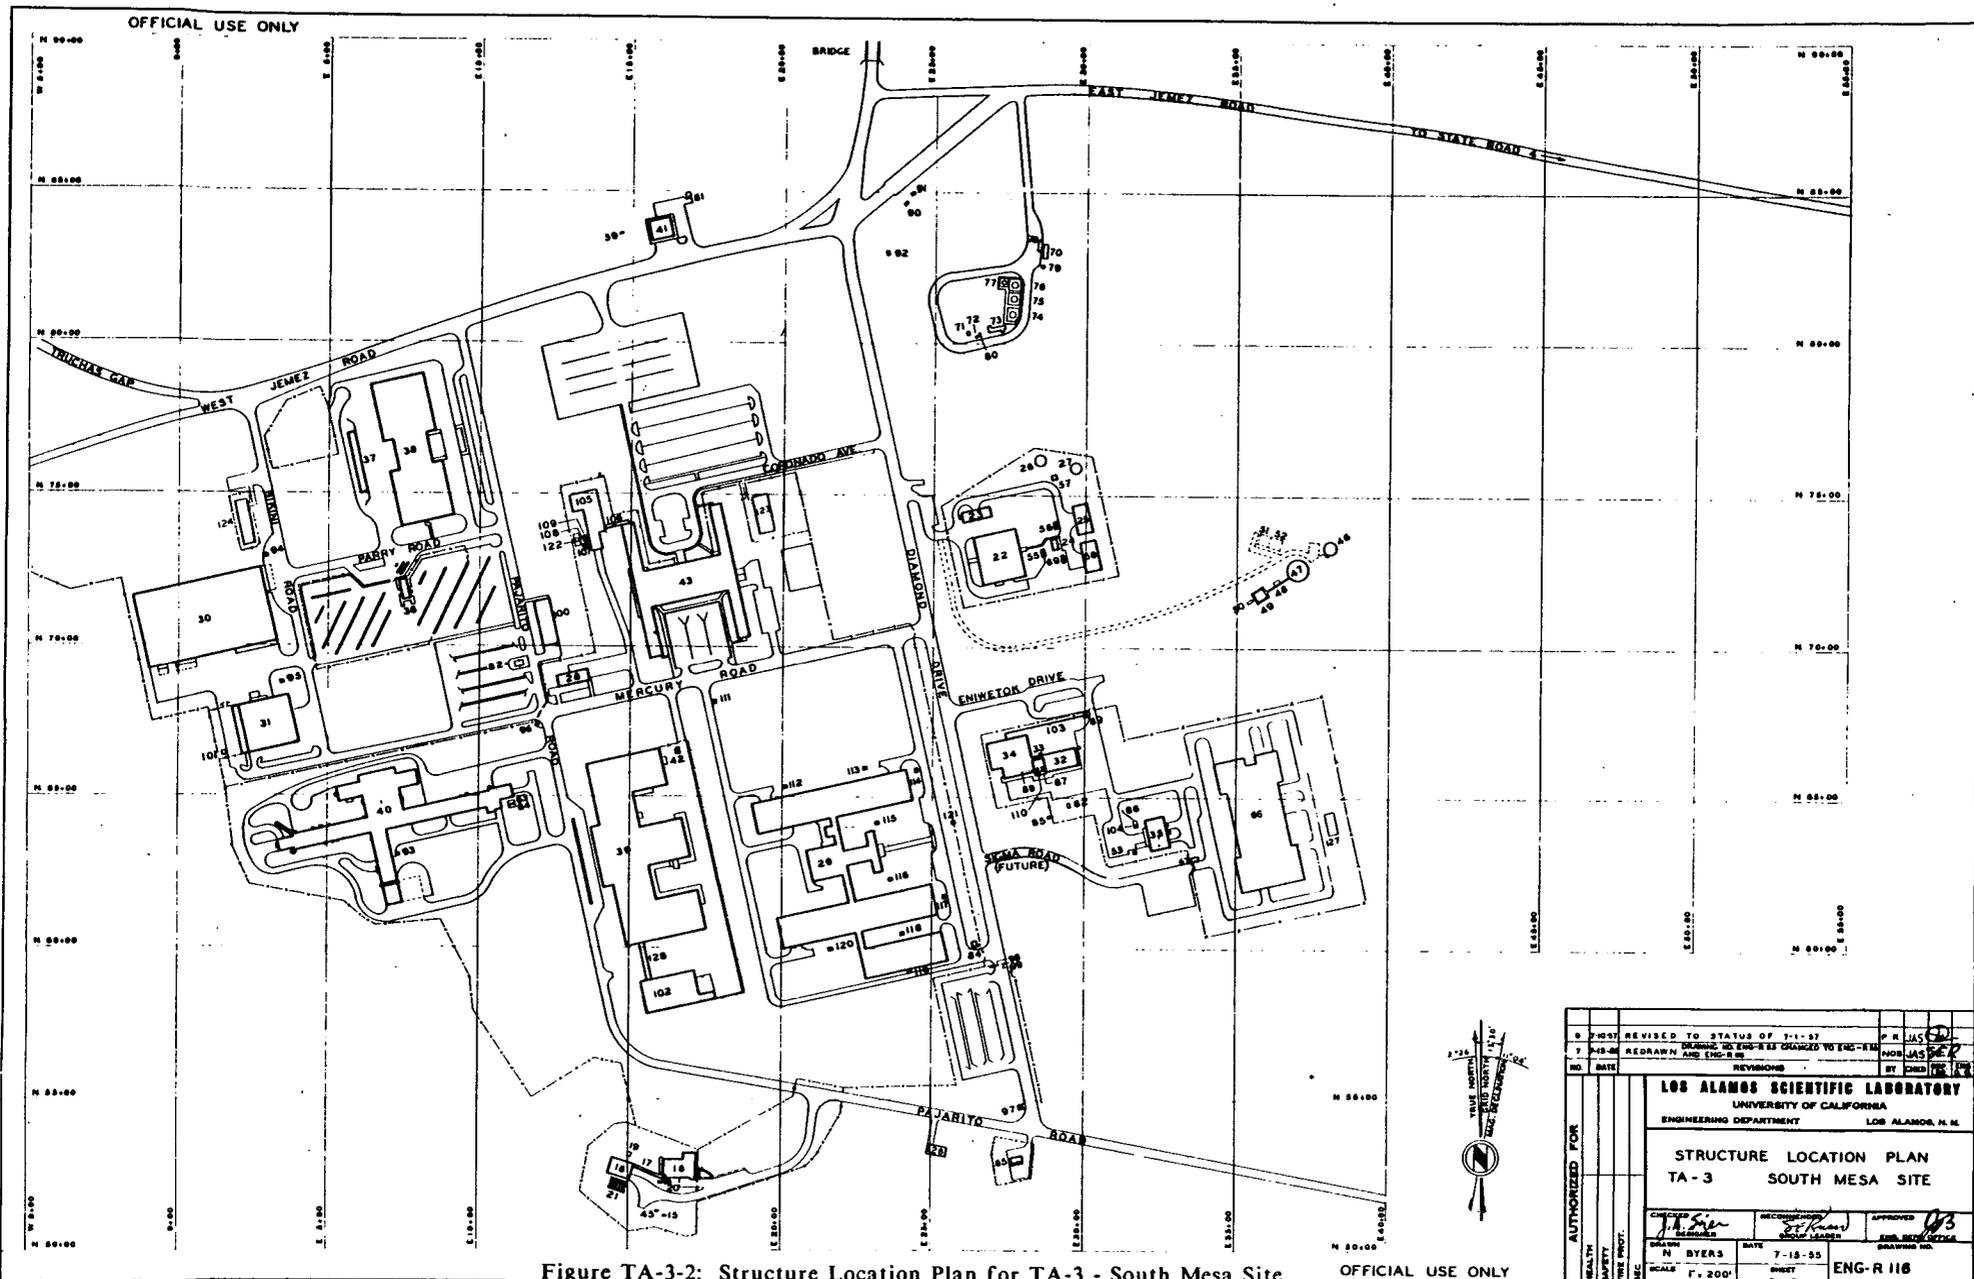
Structure Location Plan for TA-3 - South Mesa Site
